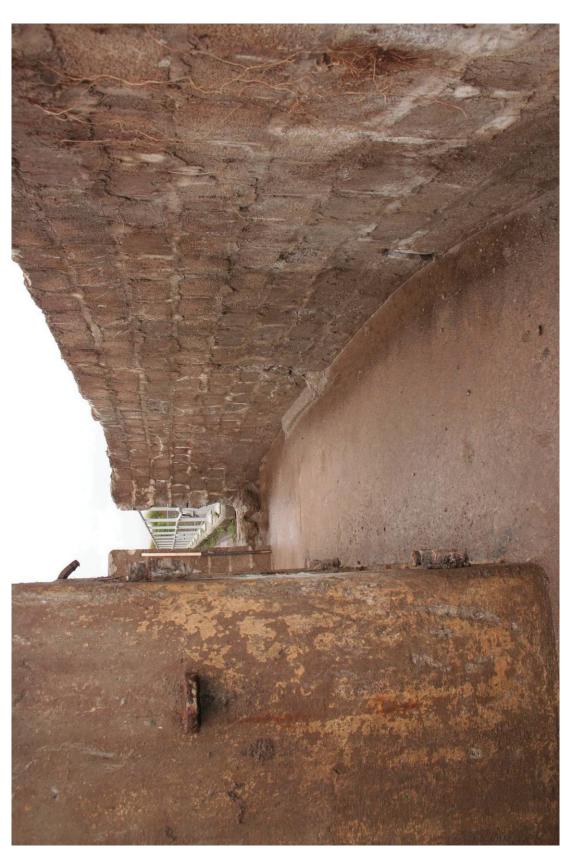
Passage along north side of emplacement, and north western entrance, facing west. The blockwork wall represents one of the modifications to the original layout of the gun pit (1m scale)
